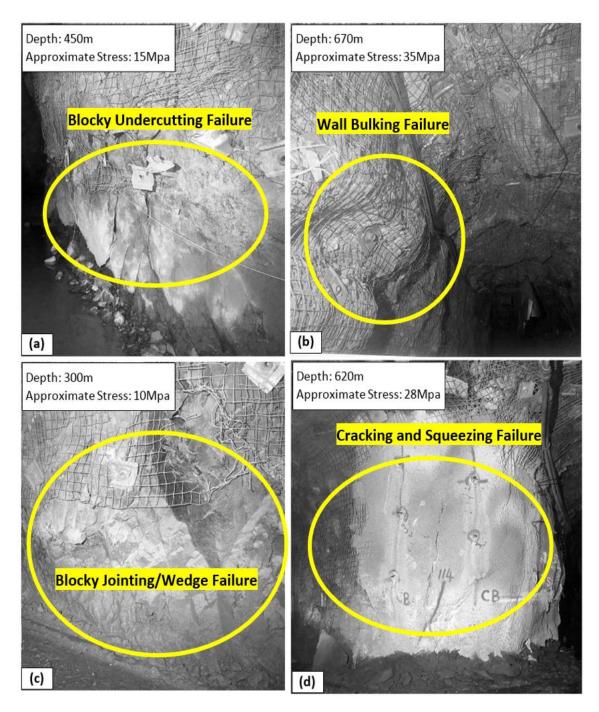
Failure mechanisms in the case deep UG mine (a) Blocky undercutting failure, (b) Wall bulking, (c) Blocky jointing (wedge failure), (d) Vertical loading and squeezing in pillar nose with cracks in fibrecrete
